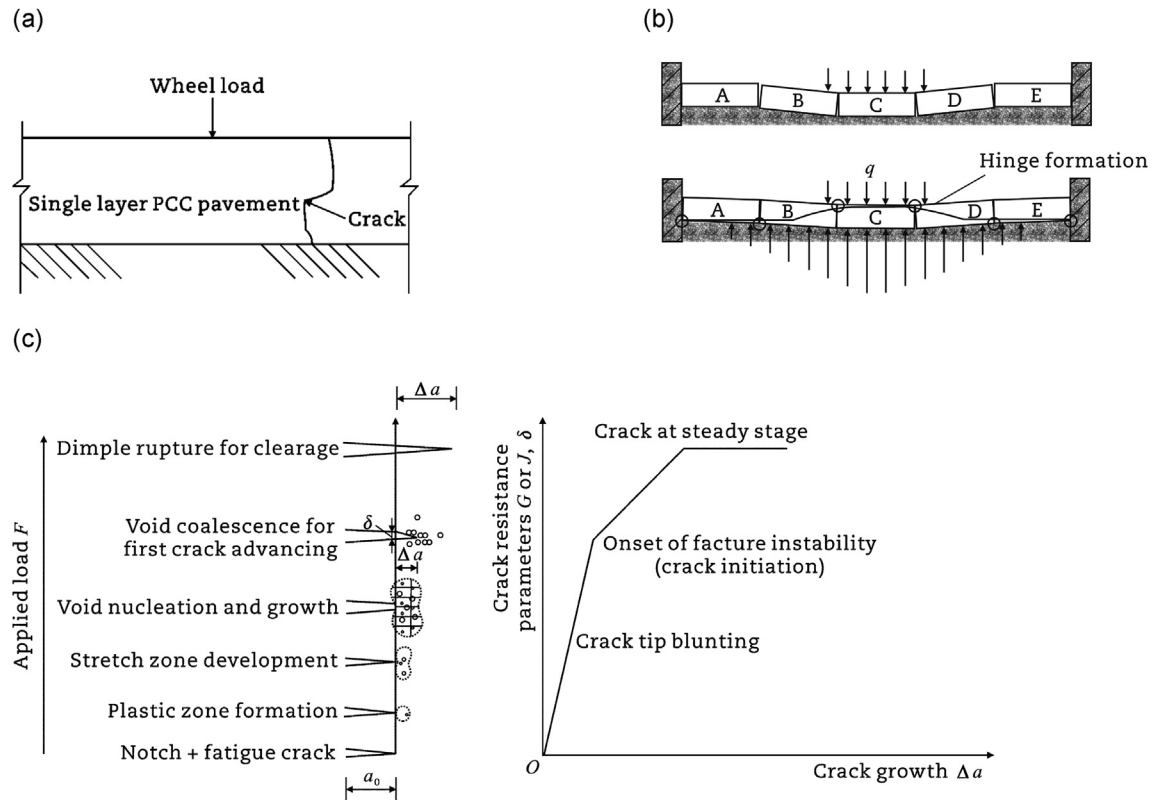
Failure modes of different pavements. (a) PCC pavement. (b) Concrete block pavement (Soutsos et al., 2011). (c) AC pavement (Tang, 2014).
